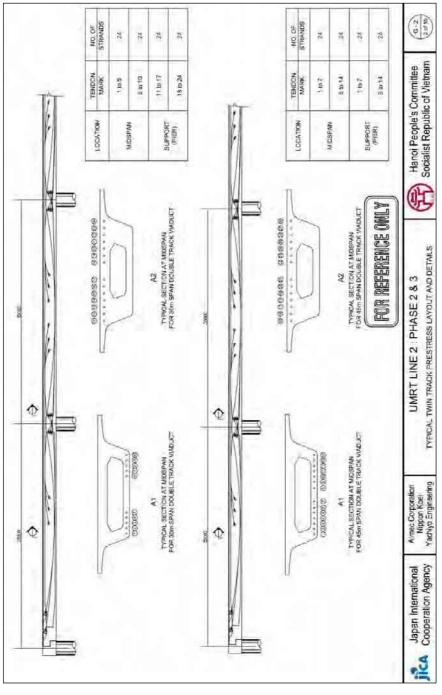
Typical Twin Track Prestress Layout and Details
